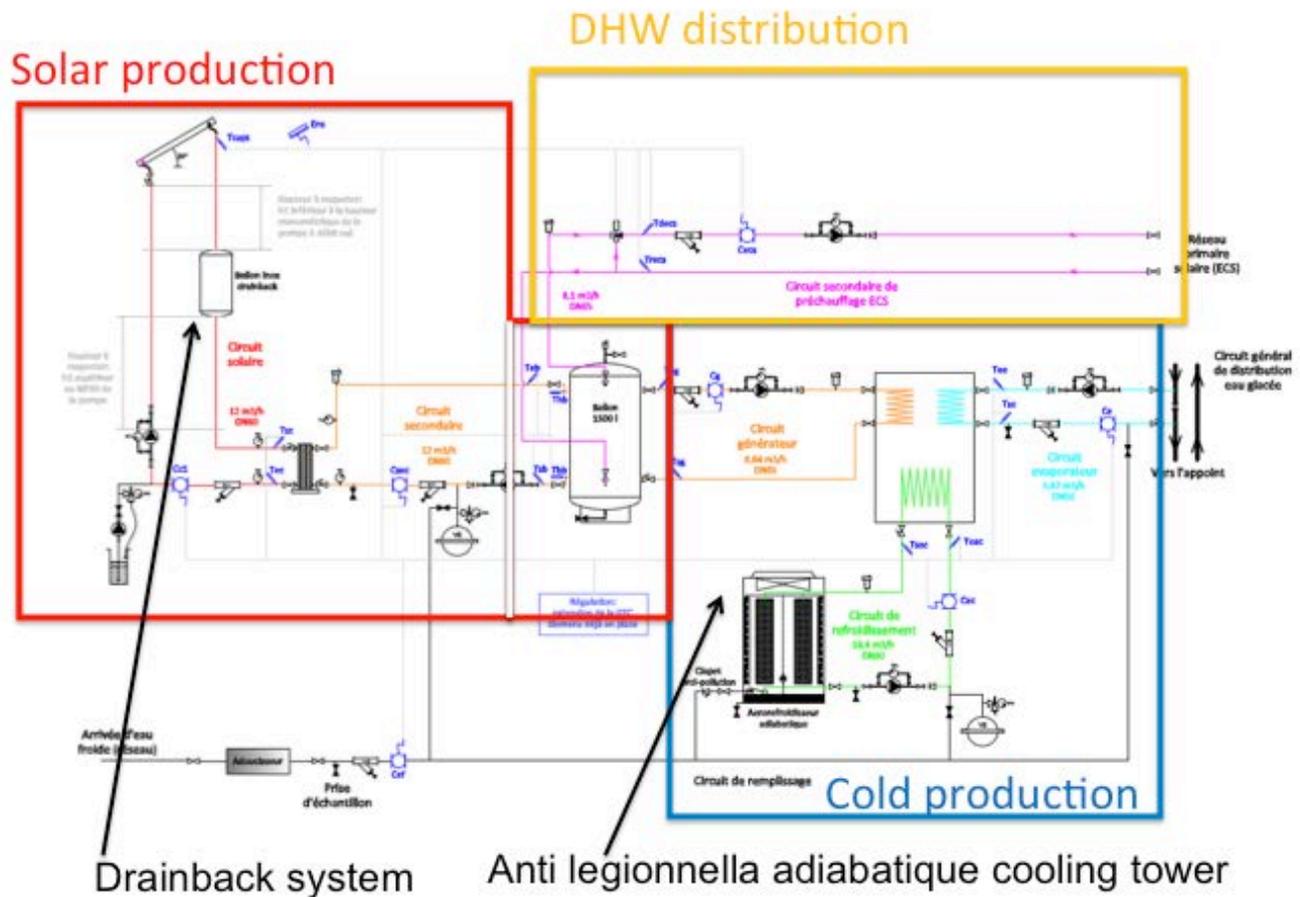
Detailed hydraulic scheme of the SHC system of the two buildings (Source: TECSOL)
